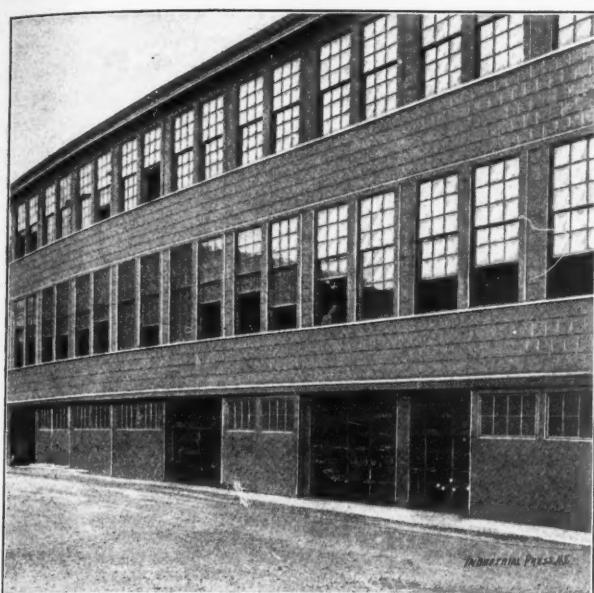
Exterior of Machine Shop Wing showing Arrangement of Store Room Doors.
